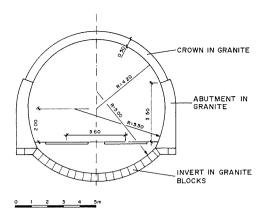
Tunnel cross-section with complete reconstrution of liner and invert designed by Schlosser, 1919-1923 in anhydritic shale (km 6.23-6.32)
